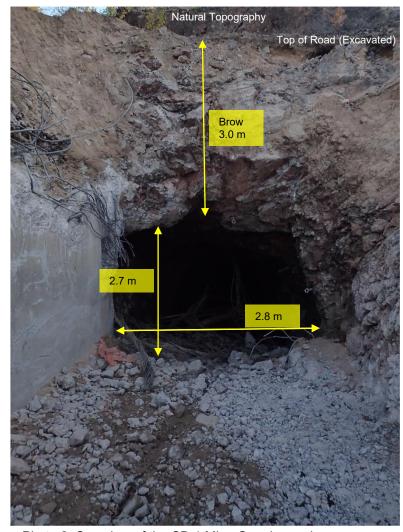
Overview of the CB-1 Mine Opening and Dimensions. Cables and conveyer belt visible within the opening.
